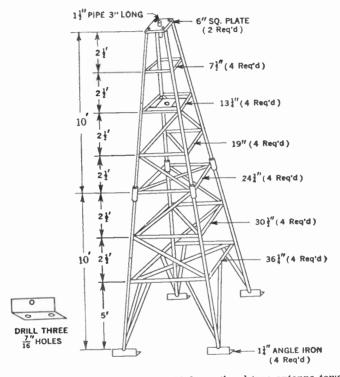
Details of construction for a 20 ft. sectional type antenna tower.
